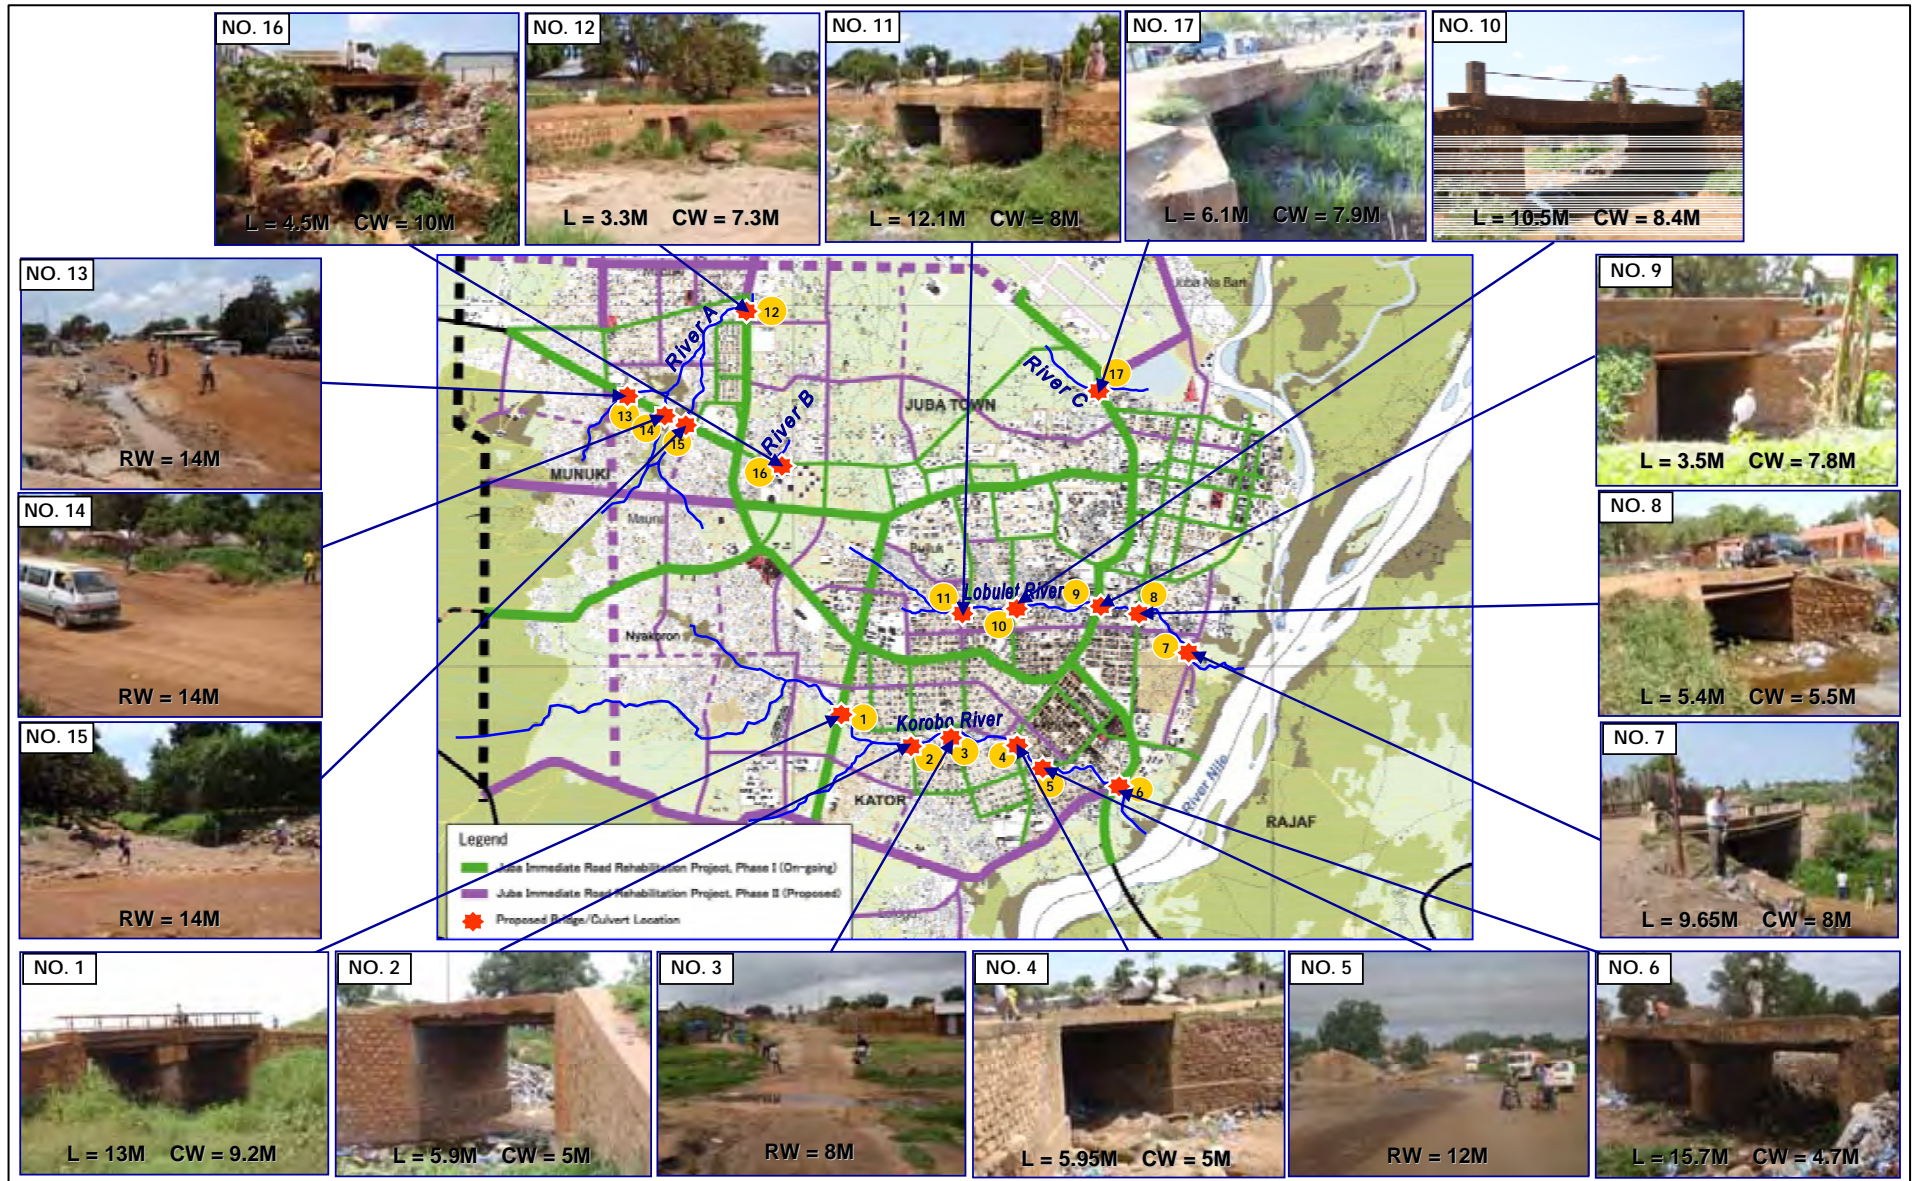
Existing Bridges and Culverts Proposed for Bridges and Culverts Reconstruction Project
